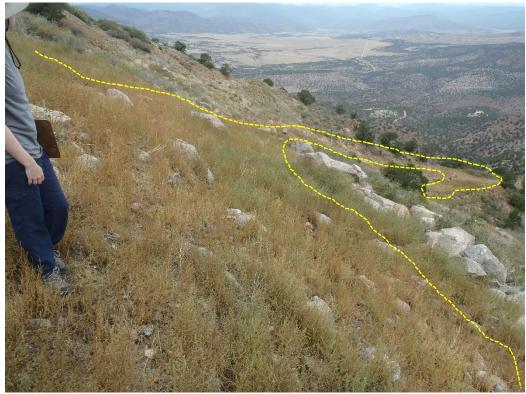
Backfilled Windy Point access Road C.1 (looking NW from highest point, Note R. thistle).
